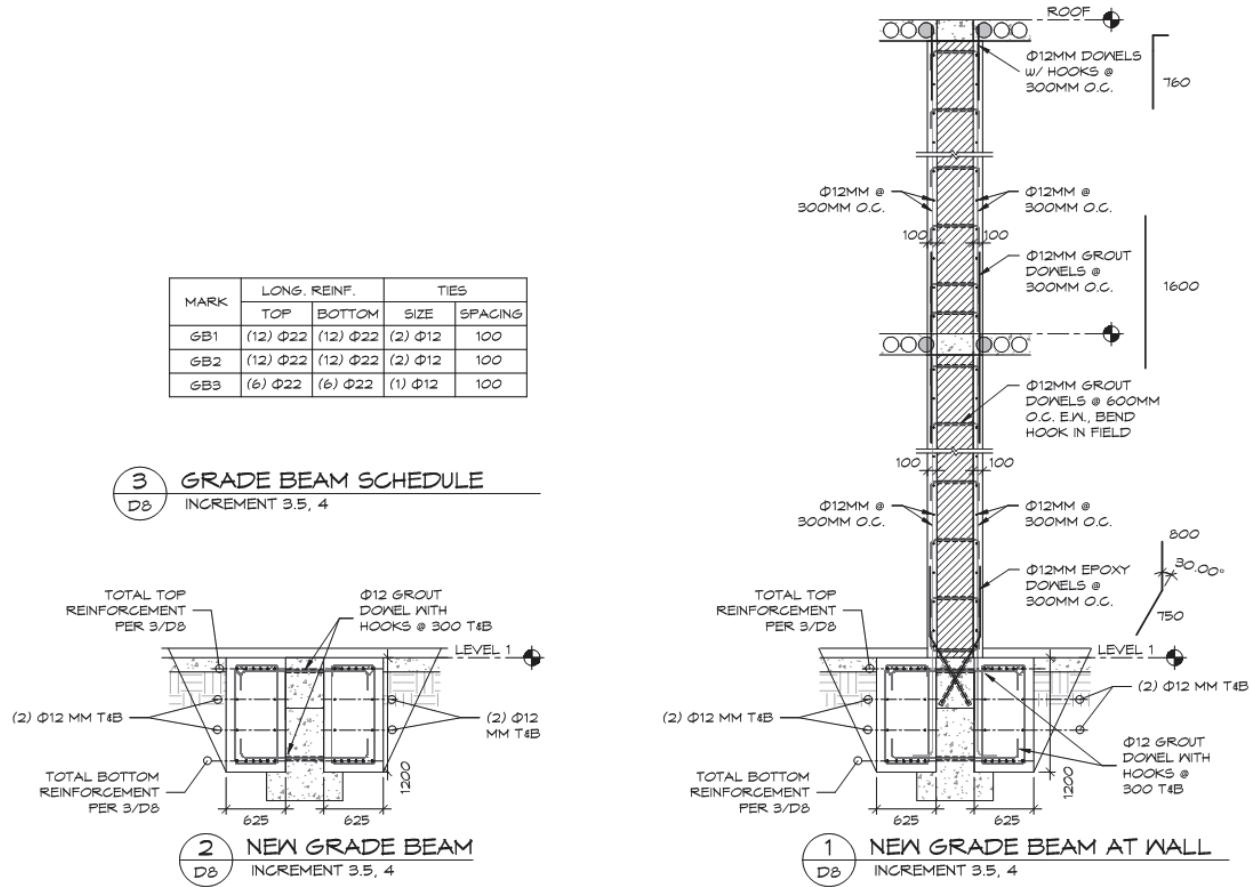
Detail of transverse grade beams in CMCF Increment 3.5.
